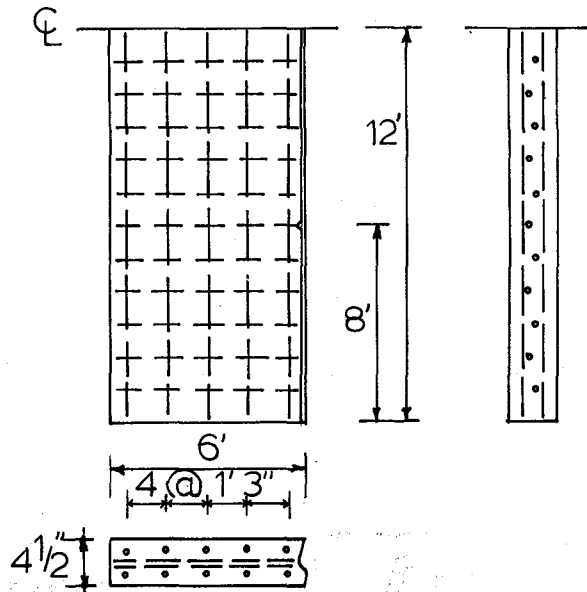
TYPICAL PANEL DETAILS, SOUTH DAKOTA PROJECT
